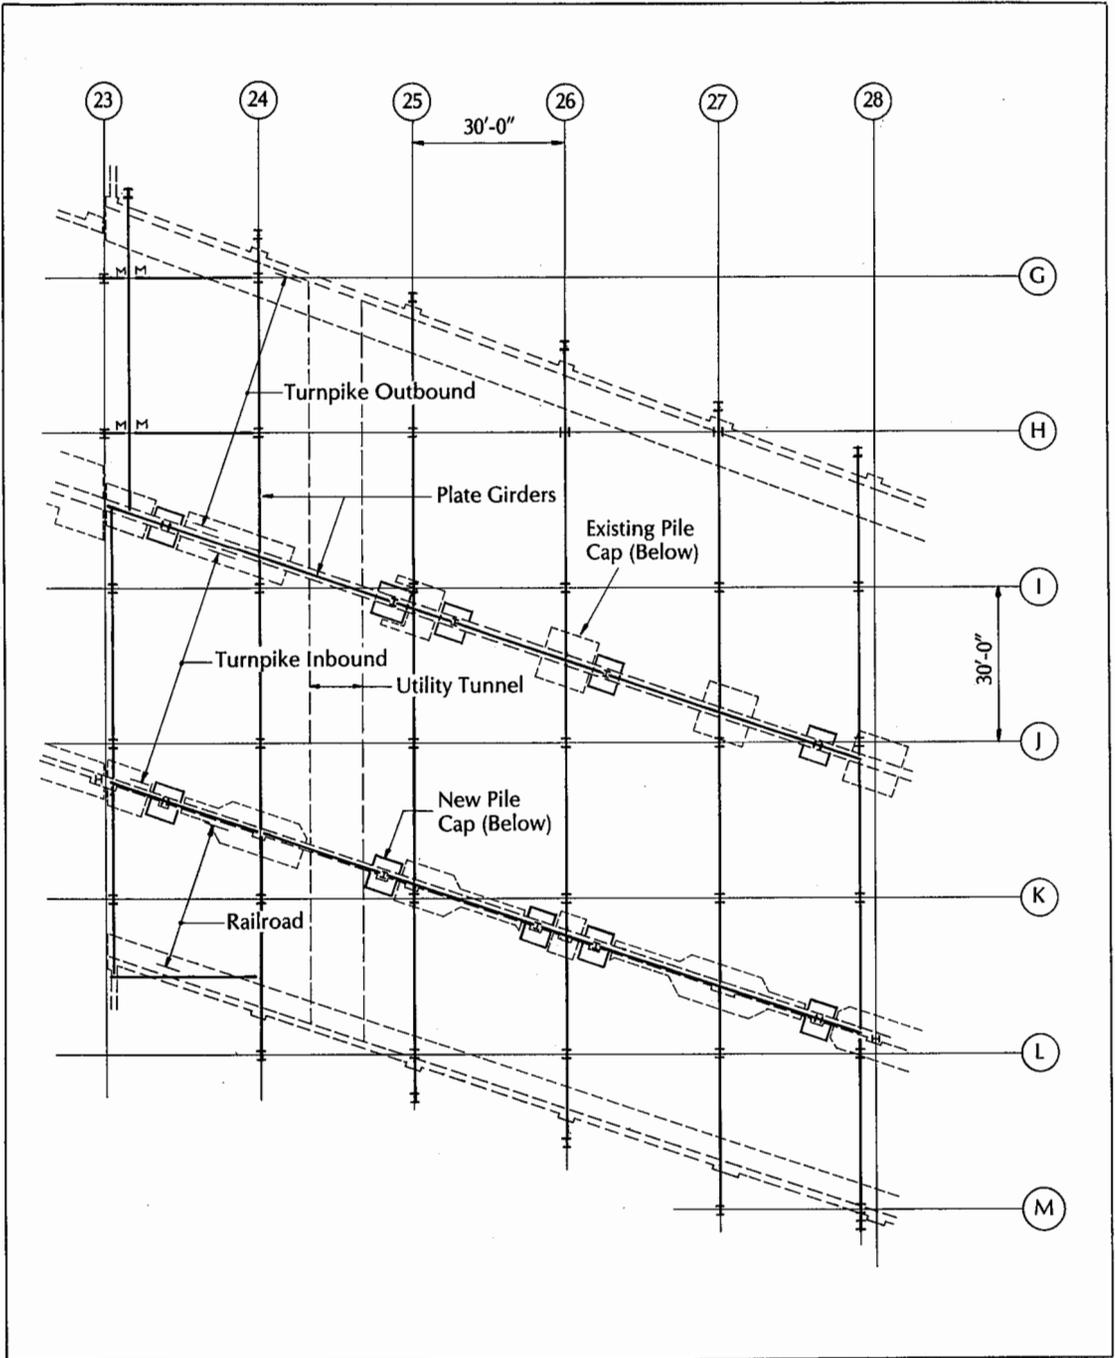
A plan of the new foundation and transfer systems within the Commercial Block C area over the turnpike/railroad rights-of-way.
